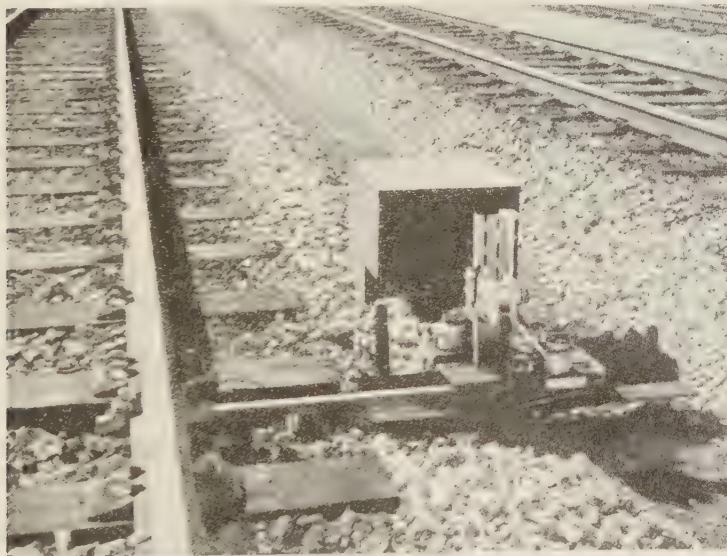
A recording point for testing long welded rails at Llanwern.
